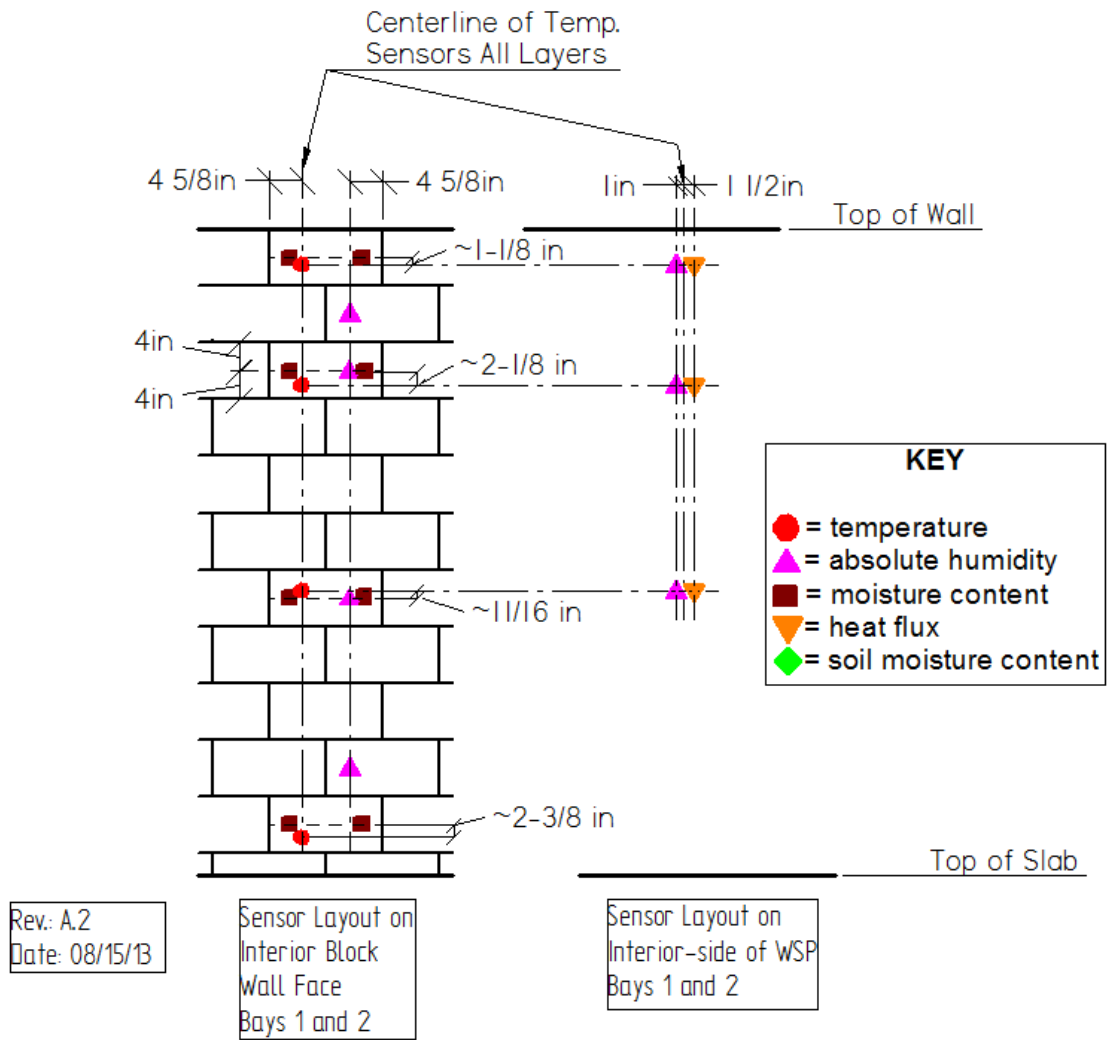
Bay 1 and 2 Wall System and Instrumentation Layout
